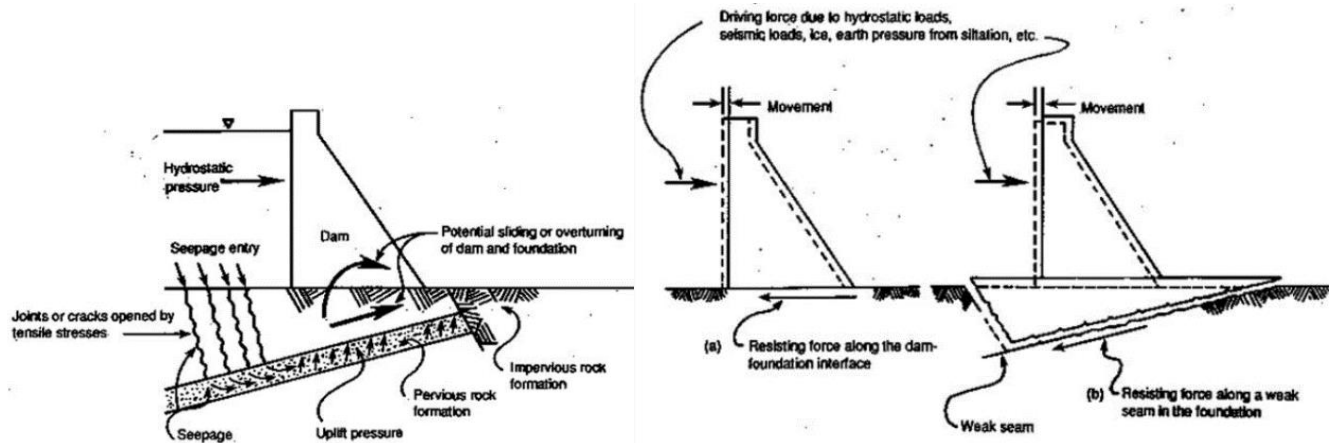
Uplift pressure in a dam (left) and sliding failure (right) (Empson, 2013)
